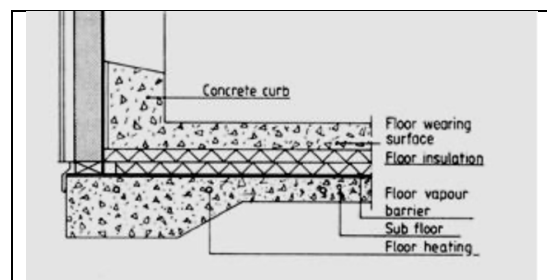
Construction of the buried sub-floor structure of your sub-zero floors¹⁸
